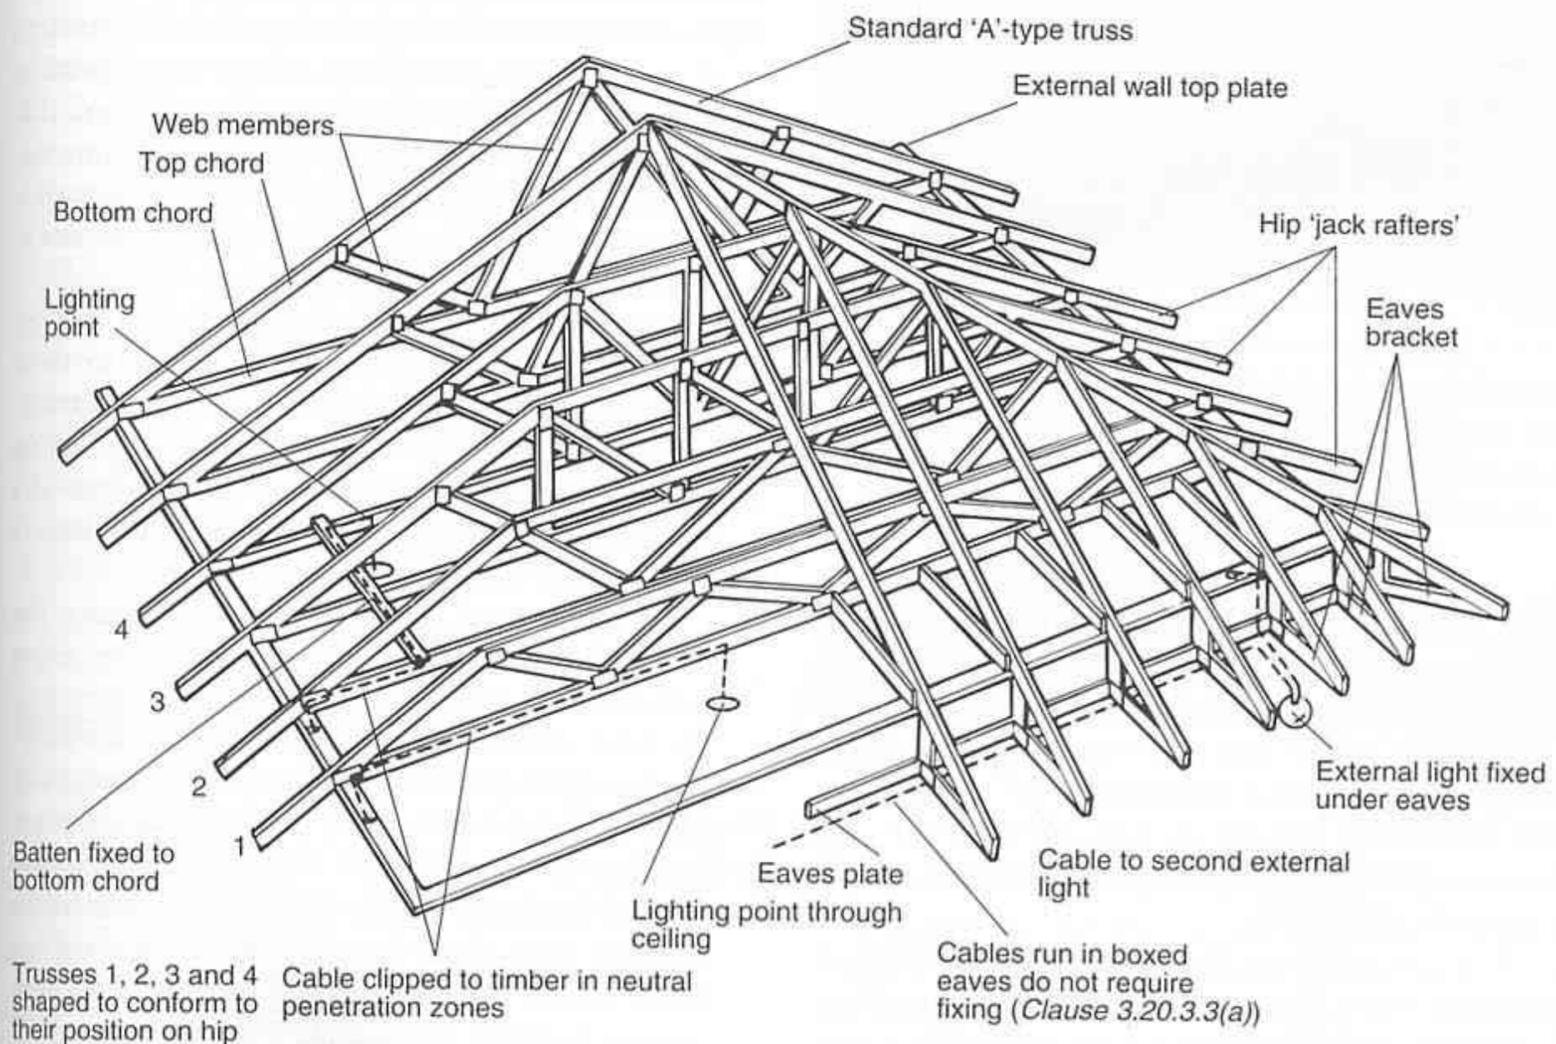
Constructional details of a roof using gang-nailed timber trusses WORKCOVER AUTHORITY OF NSW
